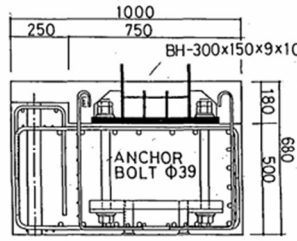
(d) Longitudinal section of B-Type specimen (unit mm)
